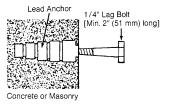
Mounting on Concrete, Concrete Block or Masonry Wall.
